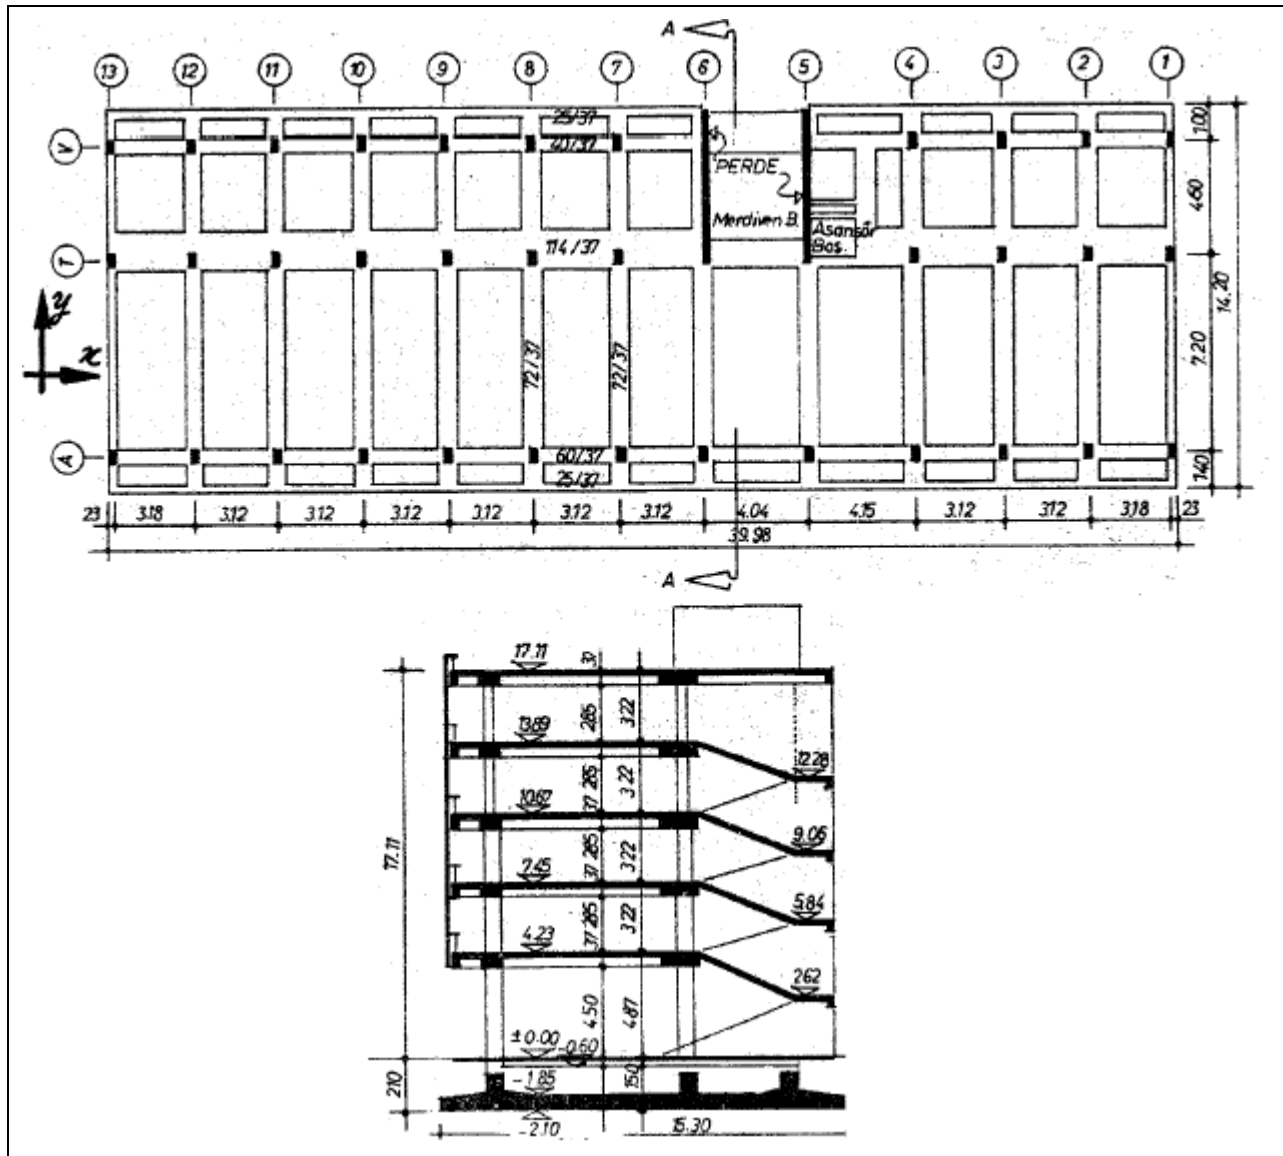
Typical plan and elevation of the original building (Anadol et al. 1972)
